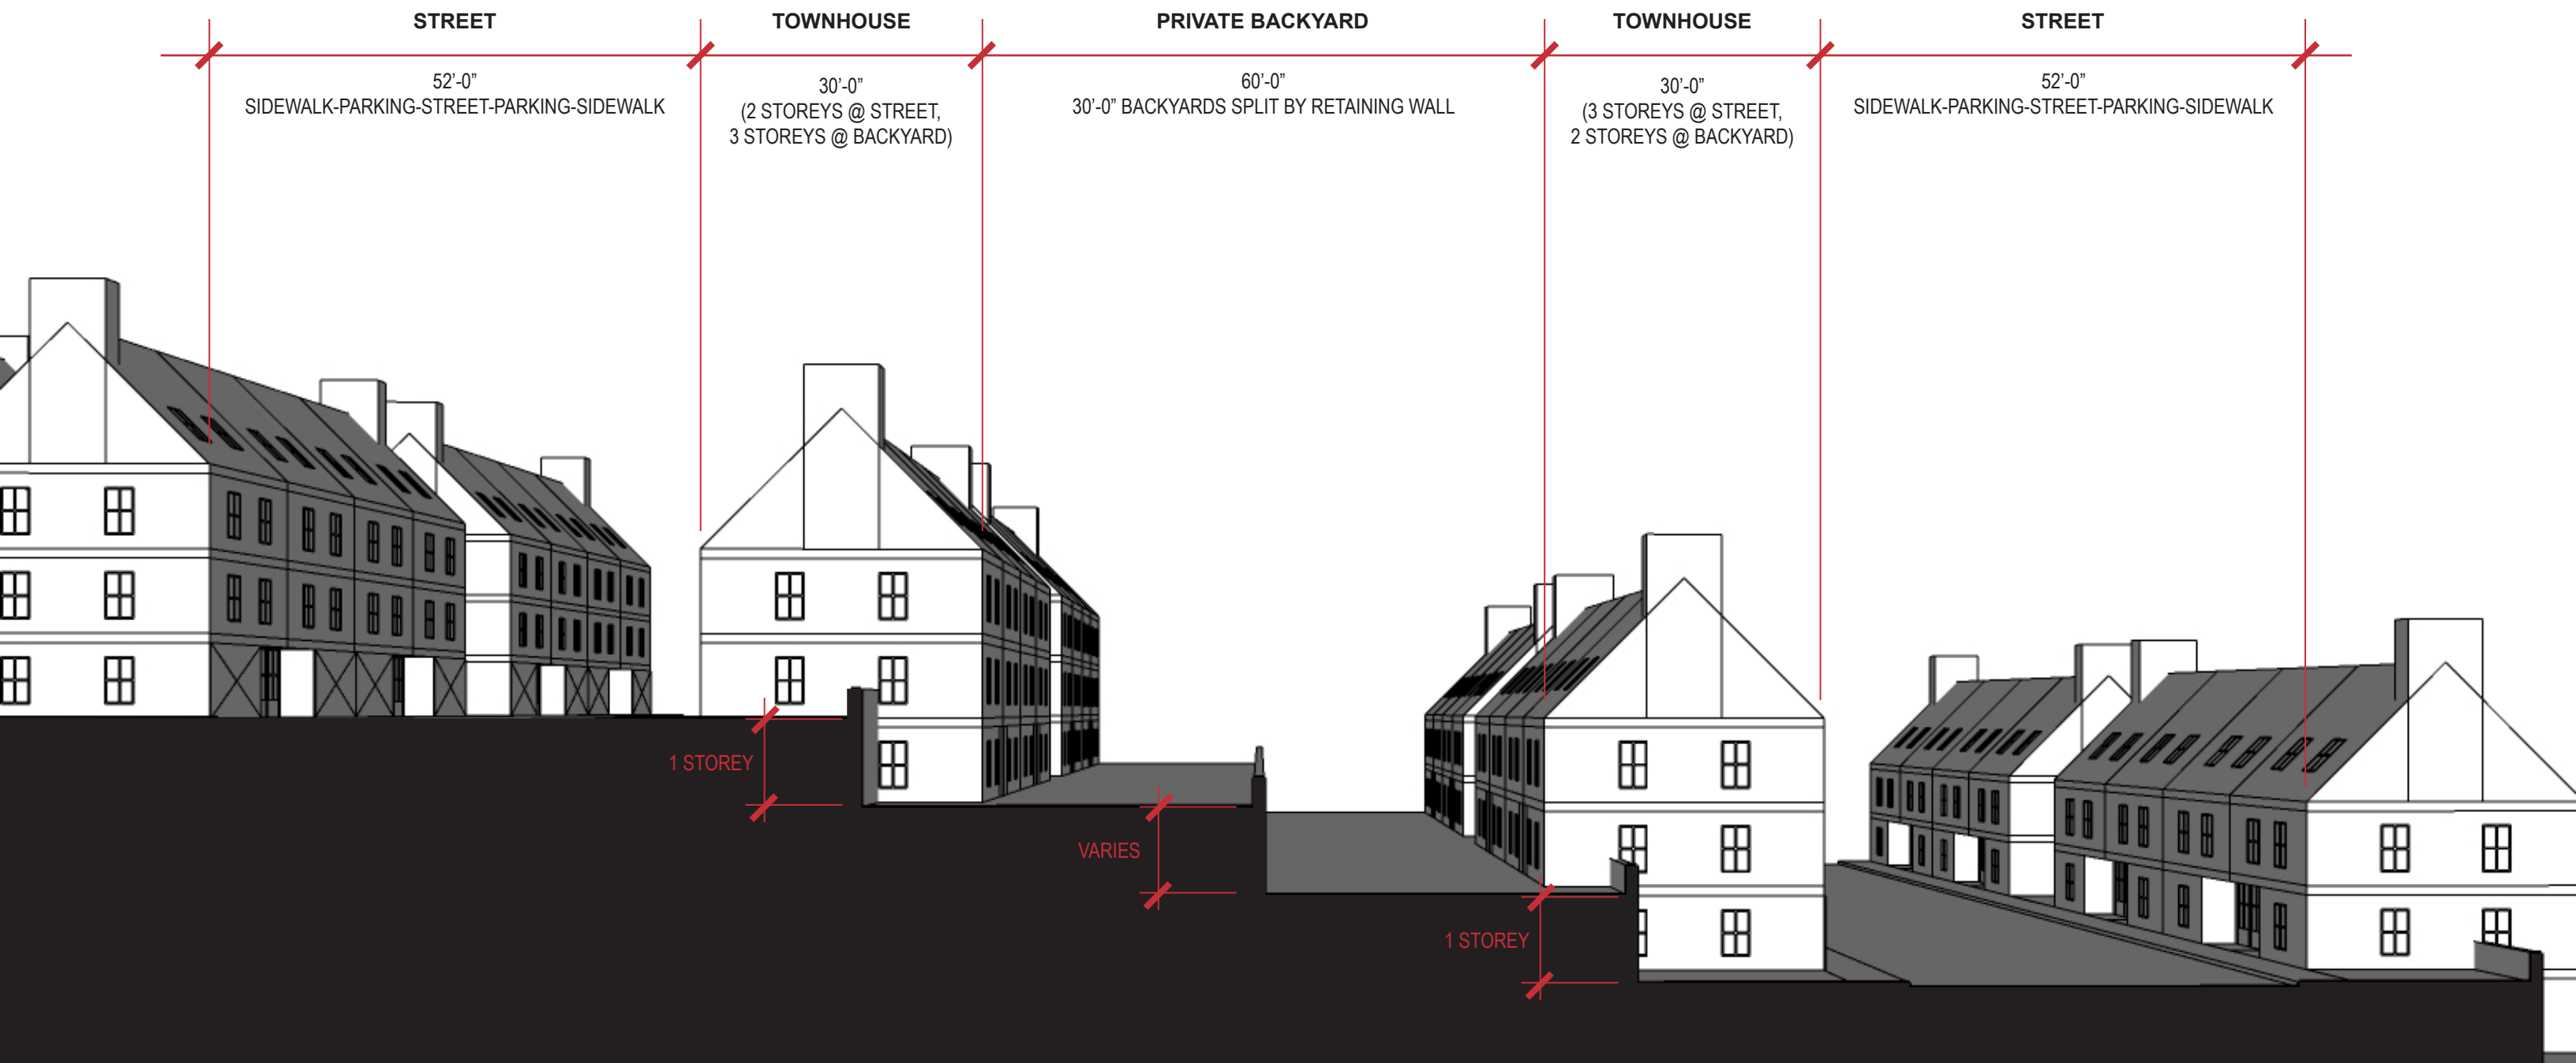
SLOPE CHANGE FROM STREET TO STREET
